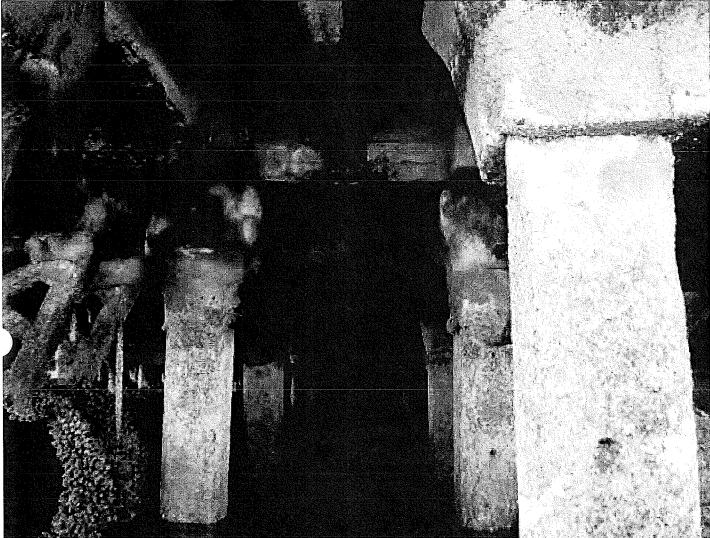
Spalled concrete beams and slabs above the outfalls under the Main Pier
